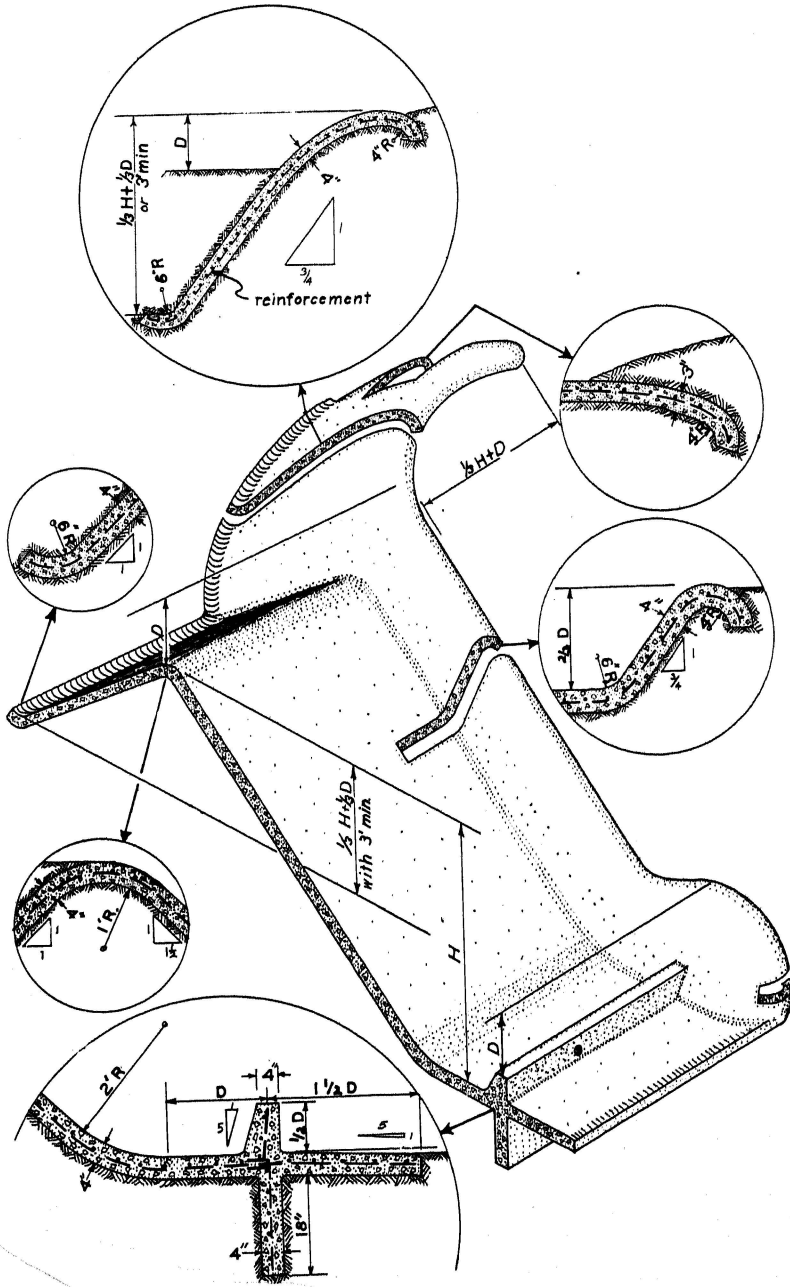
Working drawing of Missouri dam showing construction details and enlarged cut-a-way sections.
